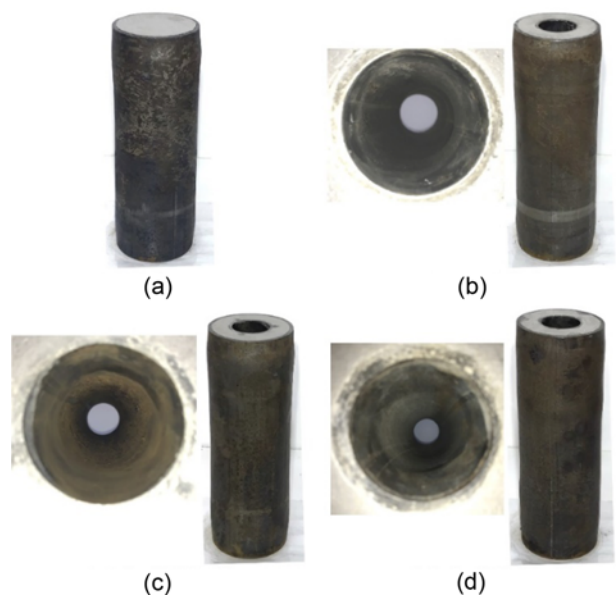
Failure Modes of: (a) C-2 Specimen, (b) 2-W0-0 Specimen, (c) 2-W60-3 Specimen, (d) 2-W114-3 Specimen
